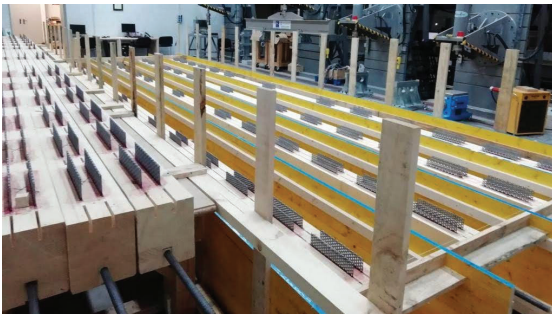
Arrangement of the beams previous to the pouring of the concrete.
